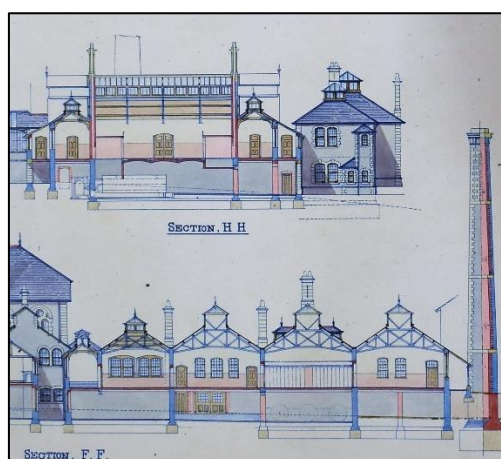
Cross Sections, 1889. East- West Section FF shows (left – right) internal corridor, female airing & delivery room, general laundry, drying closets, general wash house & the chimney. Section HH shows receiving rooms either side of the drying closets (Bristol Record Office ref. Bristol Plans/Arranged/41 [8265])
